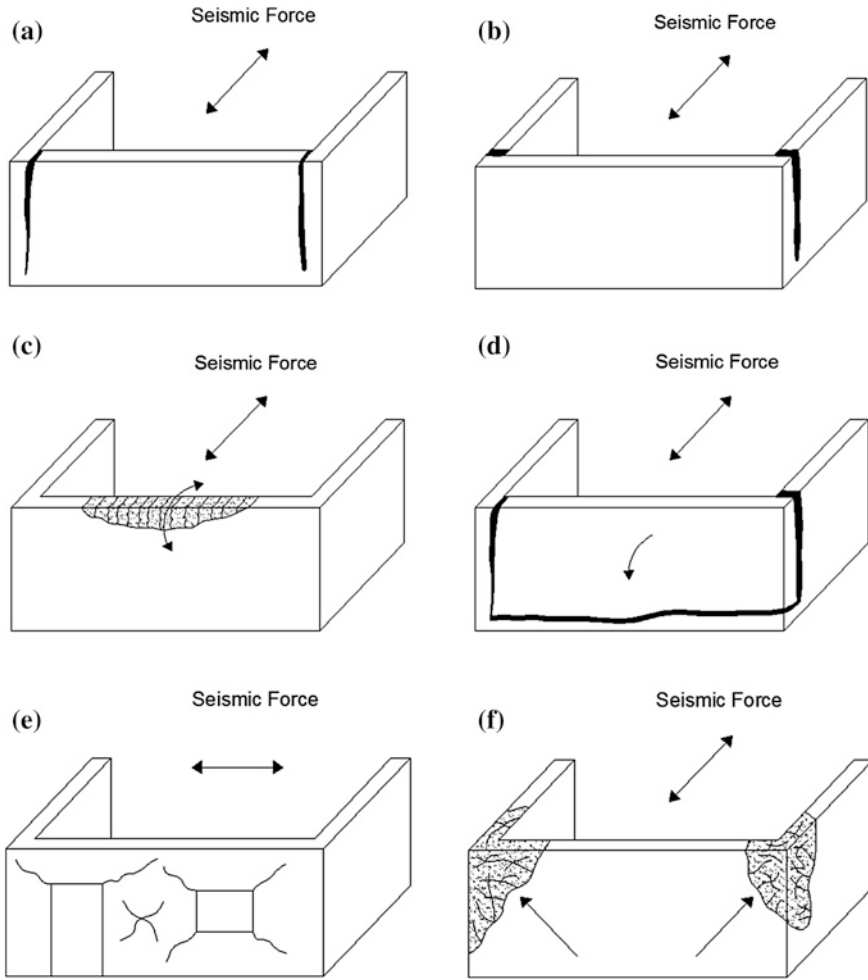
Typical damage and failure mechanisms on adobe masonry constructions [4]. a Vertical corner angle cracking due to shear forces. b Vertical corner angle cracking due to out-of-plane forces. c Diagonal cracking in wall due to in-plane shear forces. d Global overturning of wall panel. e Diagonal cracking in wall due to in-plane shear forces. f Sequence leading to corner dislocation
